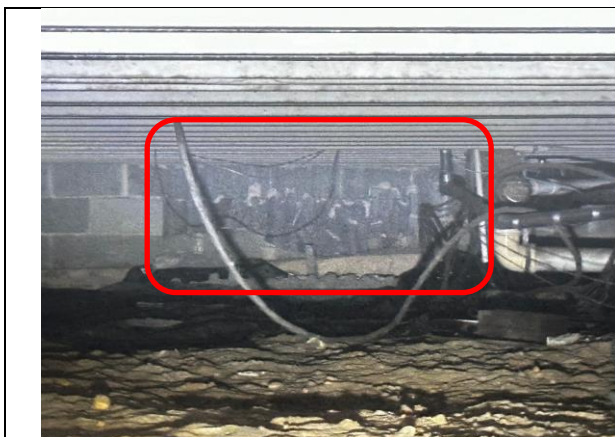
Failure of CMU shell at non-bearing wall. (Building A)
